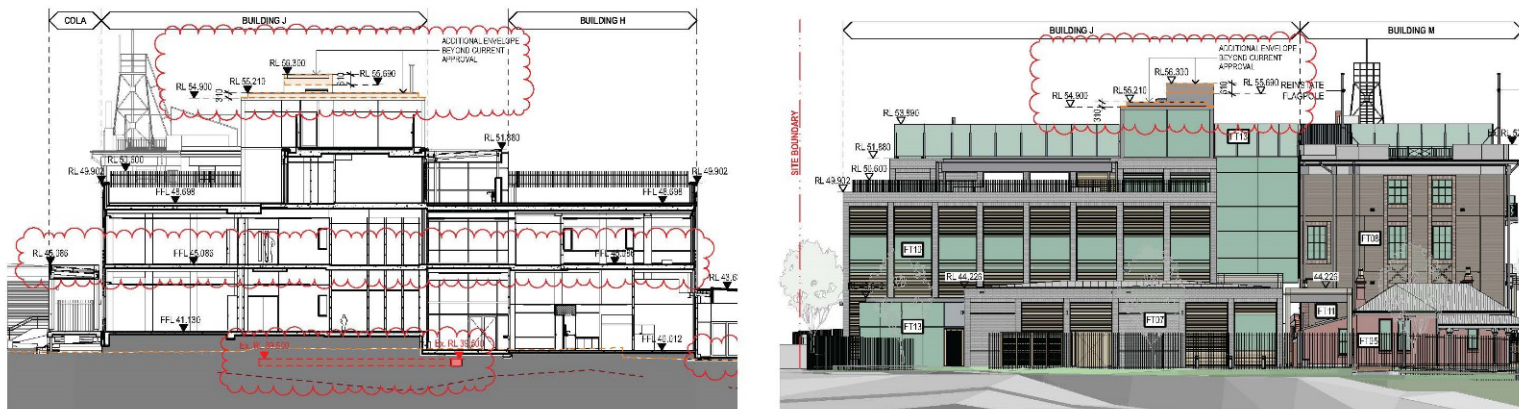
Proposed lift overrun amendment, Building J. Source. FJMT, 17 October 2022.
